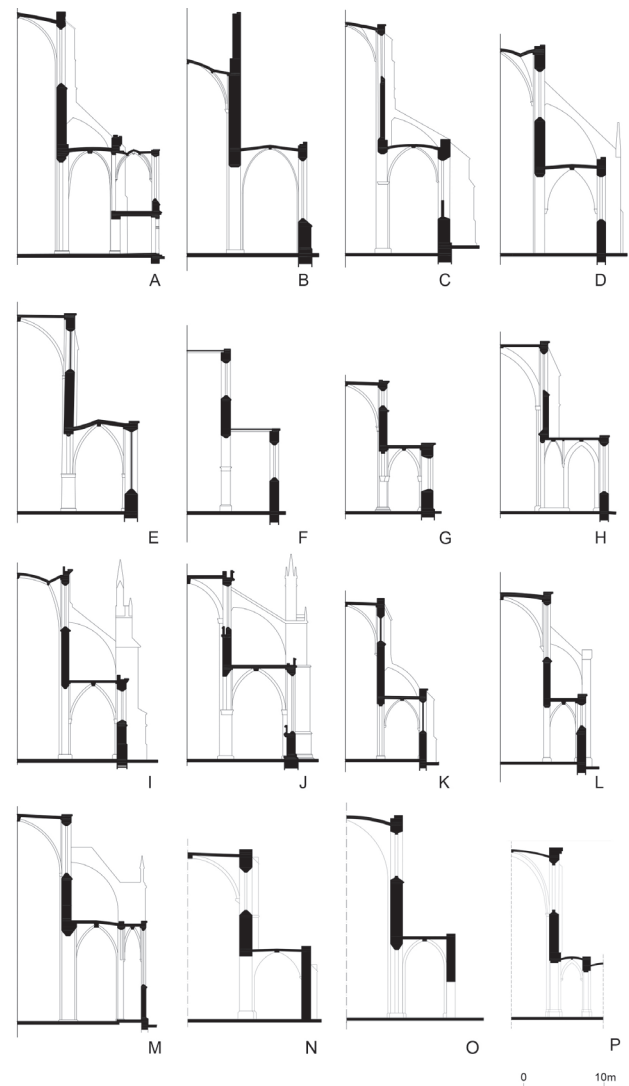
Sketches of structural systems on cross-sections of the churches discussed: A – St Elizabeth's church in Wrocław, B – St Stanislaus and Wenceslaus church in Świdnica, C – St Nicholas' church in Brzeg, D – St Peter and Paul's church in Strzegom (nave), E – Dominican church in Regensburg, F – Franciscan church in Regensburg, G – Cistercian church in Lahr, H – Cistercian church in Salem, I – St Theobald church in Thann, J – Cathedral in Freiburg im Breisgau, K – Cistercian church in Kaisheim, L – St Pierre-le-Jeune church in Strasbourg, M – St Lawrence church in Nuremberg, N – Dominican church in České Budějovice, O – Cistercian church in Zlatá Koruna, P – Cistercian church in Lübbau (compiled by F. Hackemer)
